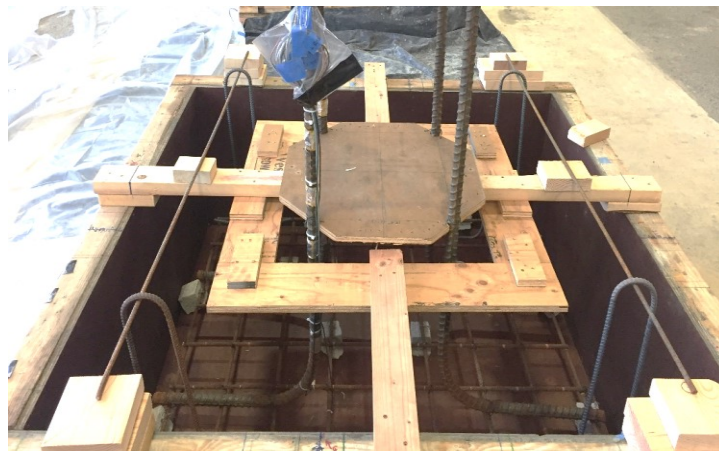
Photograph of typical footing reinforcing details (not typical of footing designs for vintage columns)
